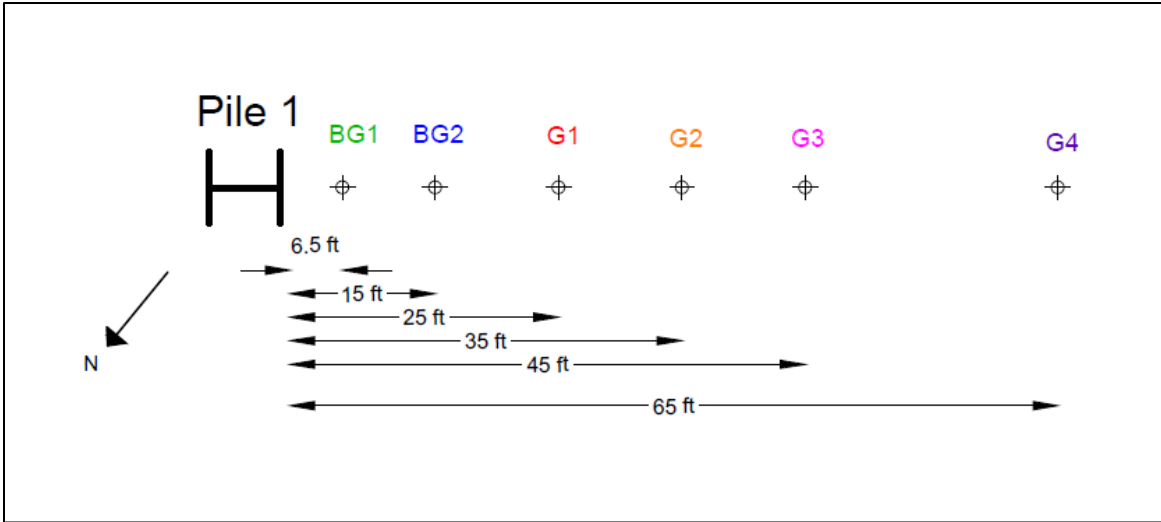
Plan view of surface geophone locations at US 131A site (Pile 1)
